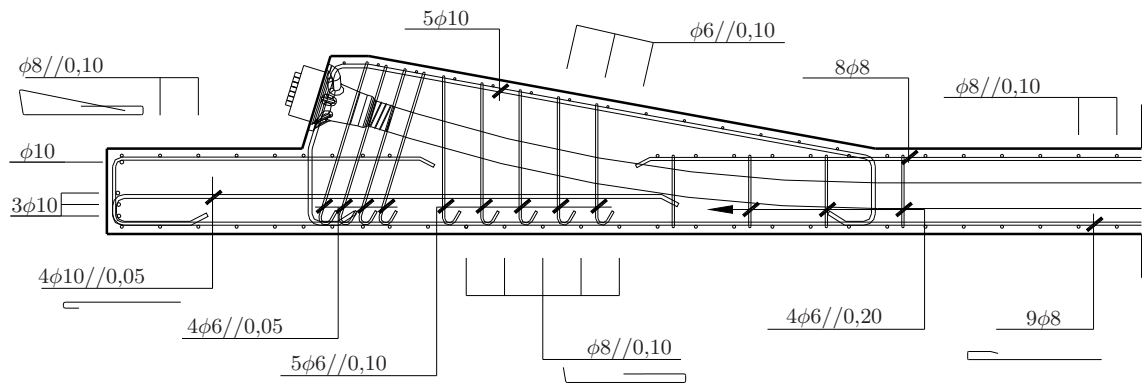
Reinforcement in the blister anchorage zone for tendon B
